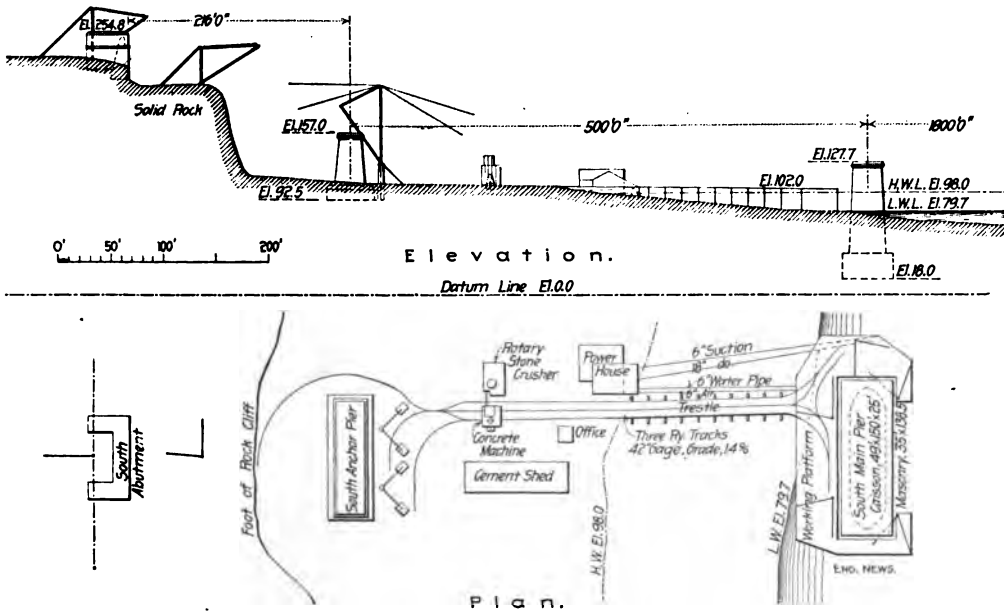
PLAN AND ELEVATION OF CONTRACTOR'S PLANT FOR SOUTH SHORE ABUTMENT AND PIERS.
